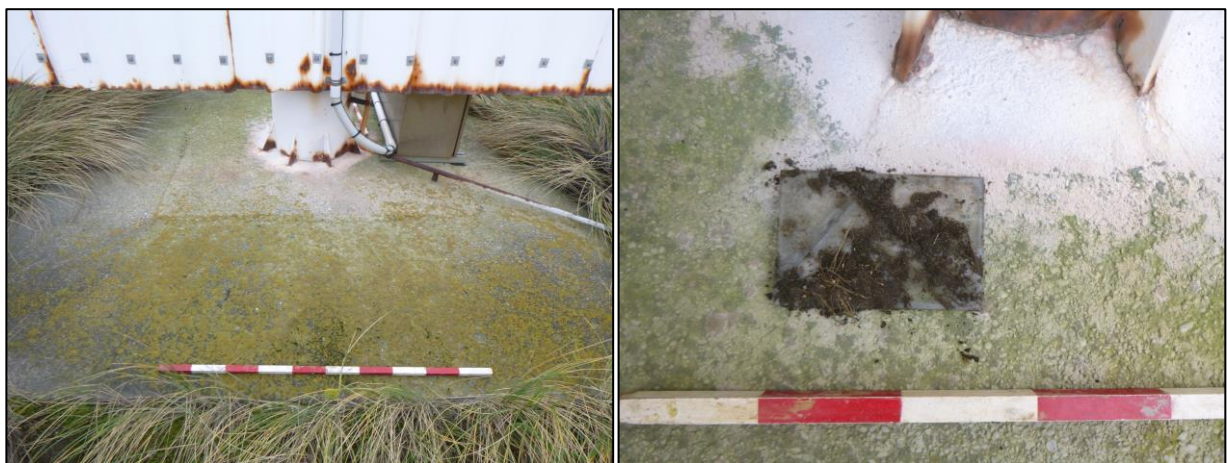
View of concrete foundation of extant beacon (left, looking south); close up of glass plate (right).
